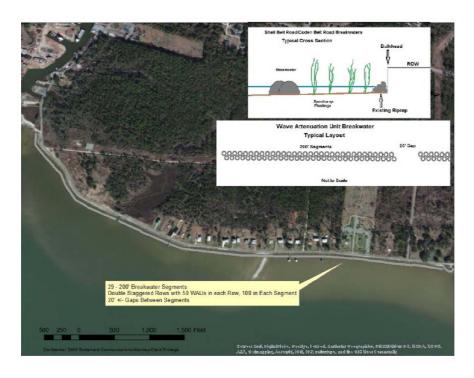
Coden Belt Road Living Shoreline, Alabama. Proposed Project Layout.
